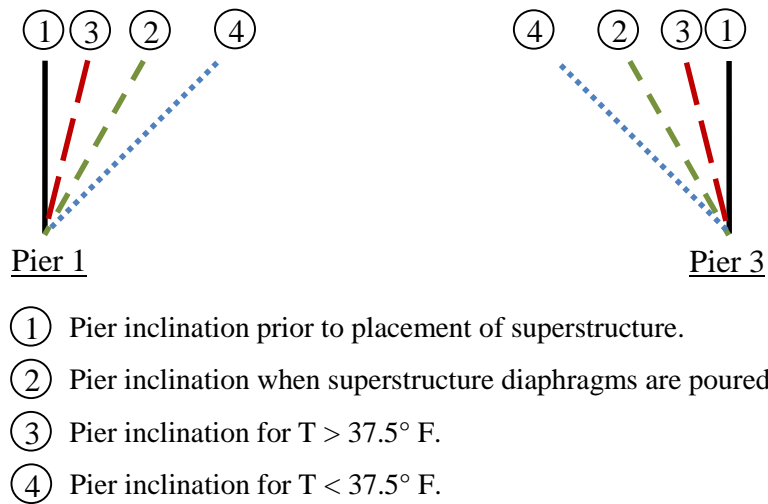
Bridge elevation schematic of longitudinal pier rotations versus temperature.
